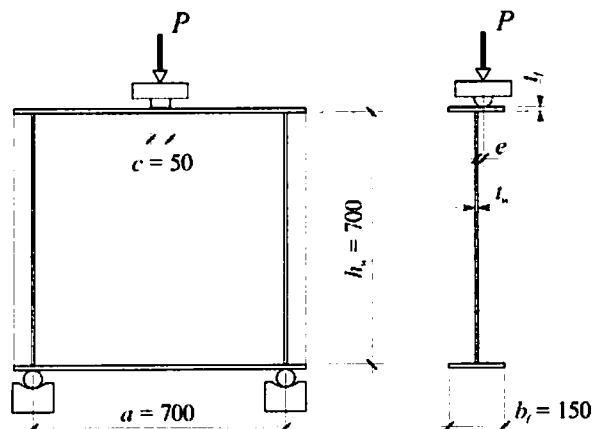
Eccentrically patch loaded I-girder – specimen of "Ekscentro 2007"
